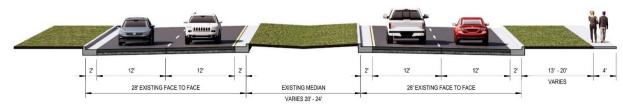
WIS 13 to County A (North) Existing Typical Section, facing north
